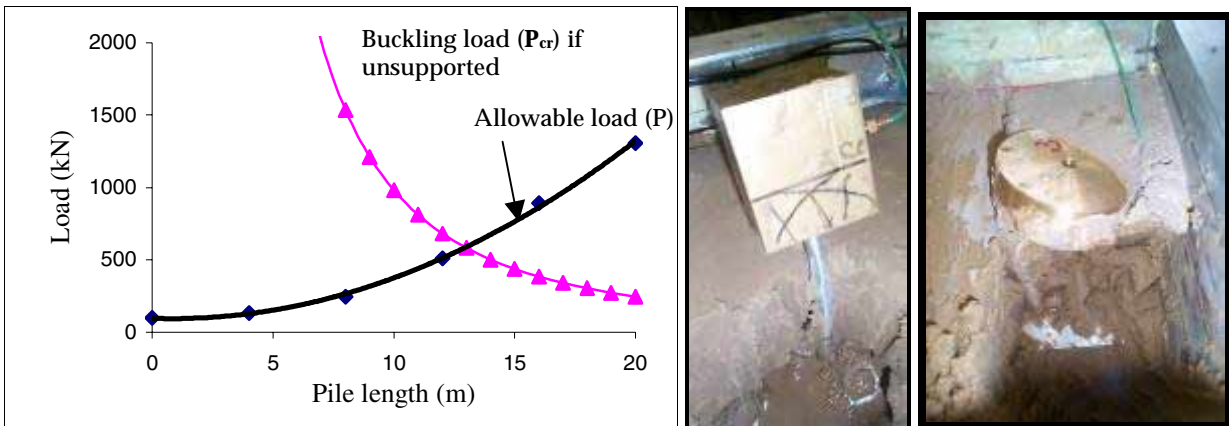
(a): Allowable load and buckling load of a pile (if unsupported); (b): Pile buckling in a centrifuge test.
